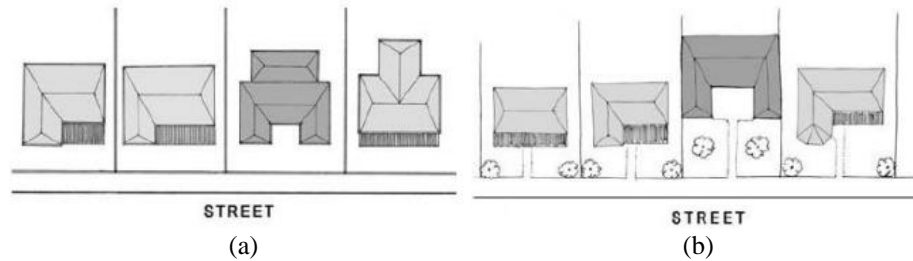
Example of applying building setbacks to the building infill concept (a). Before applying the Setback element (b) After applying the setback element. [17]
